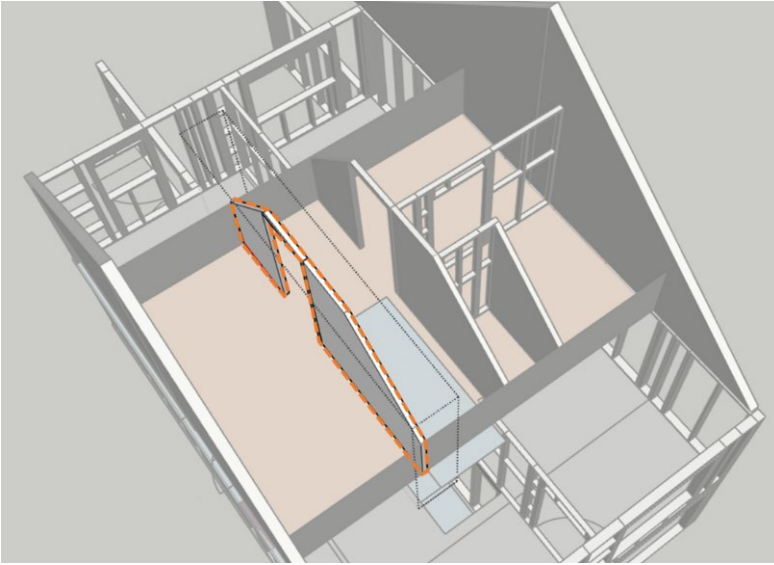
Internal walls on second floor after downsizing. Wall panels marked with orange line will likely be removed.
